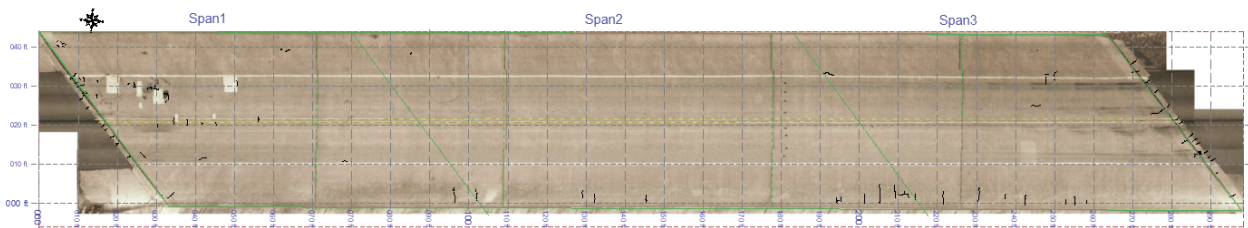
Existing Cracks on Bridge Deck No. 22451- Overall View Image
